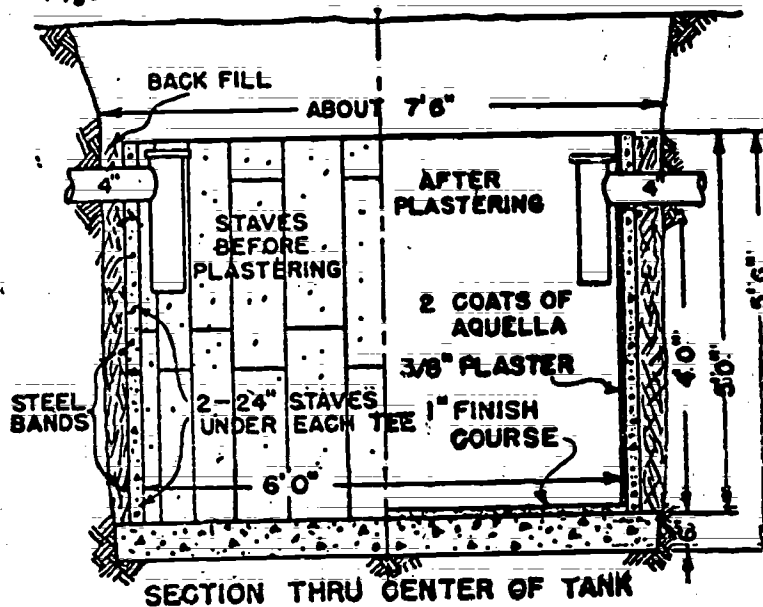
Longitudinal section of single-compartment Concrete Septic Tank
